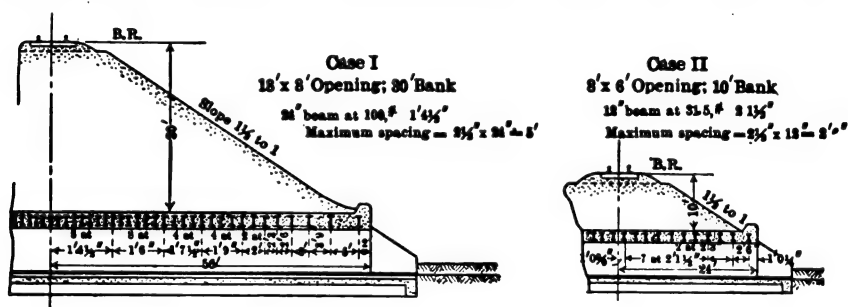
TYPICAL BEAM SPACING, GRAND TRUNK RY. CULVERTS.
